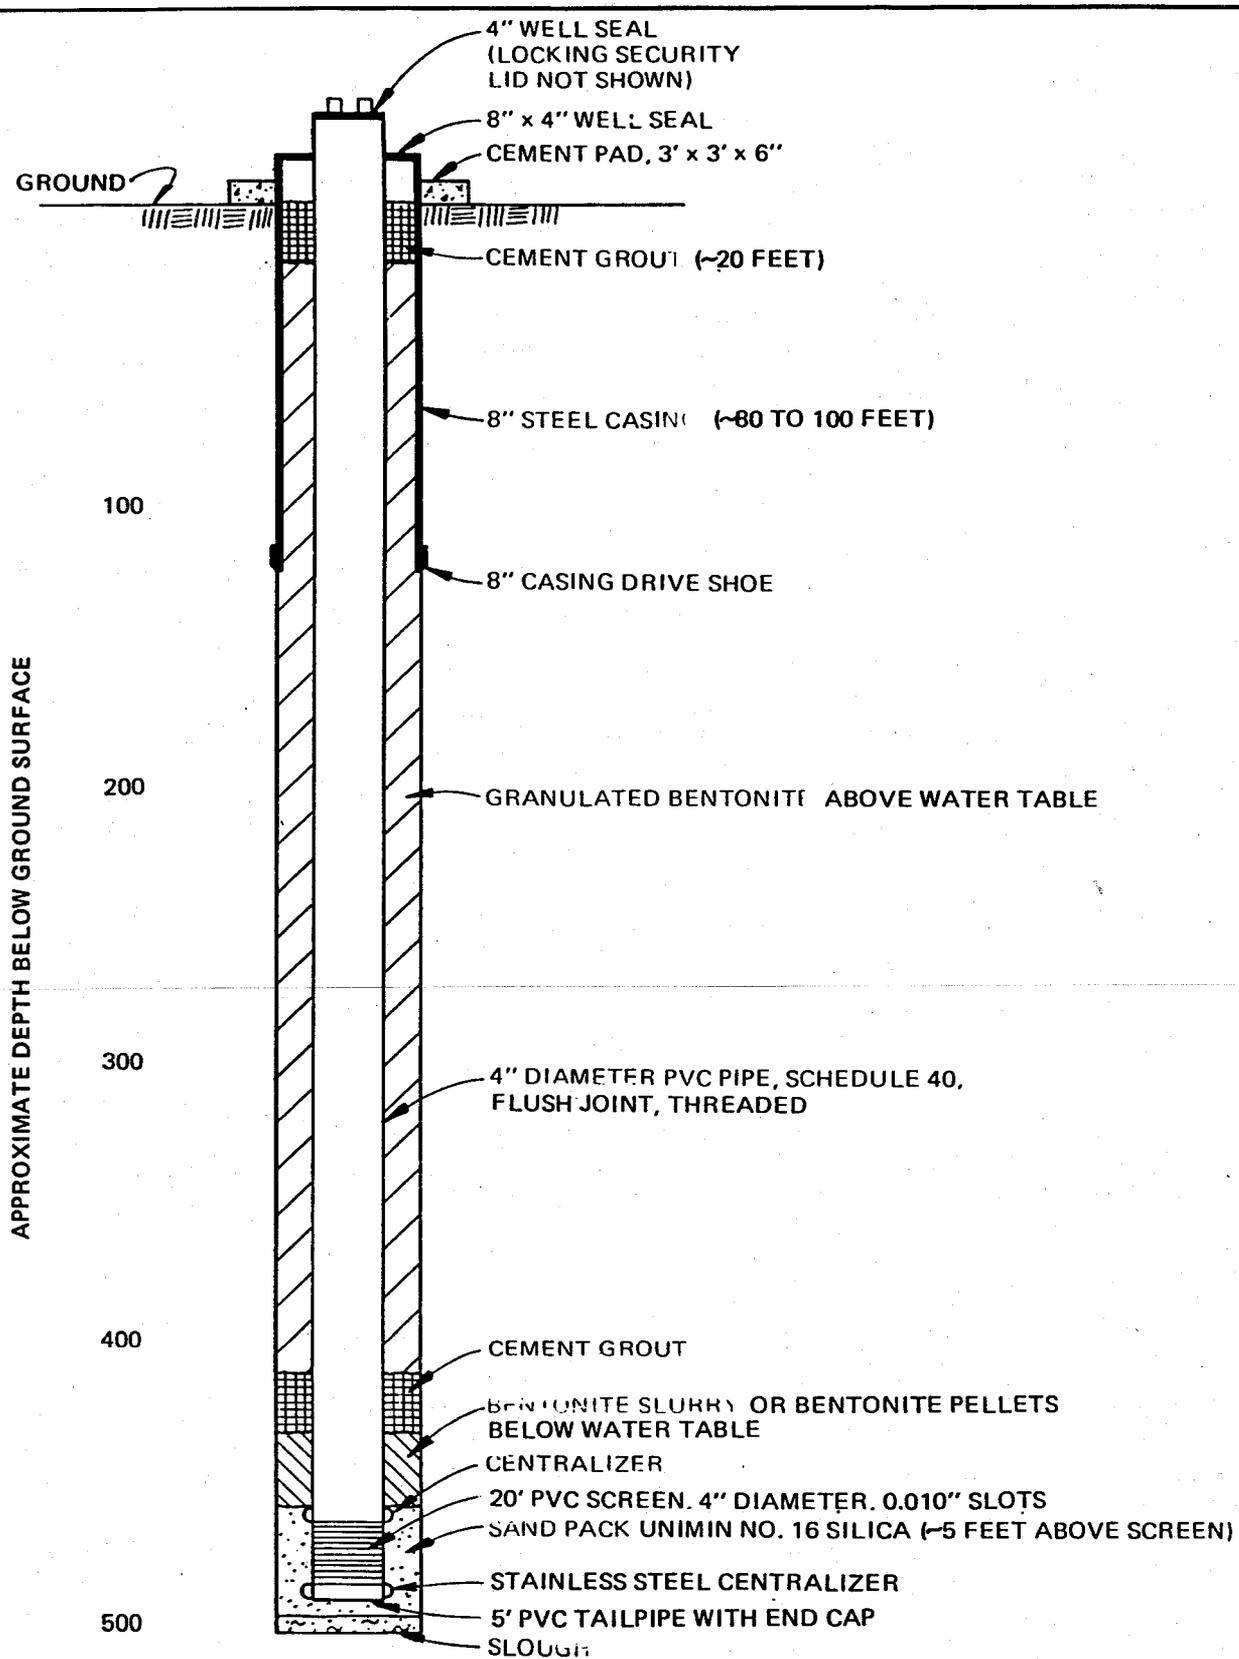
Typical 4-Inch Monitoring Well Installation
